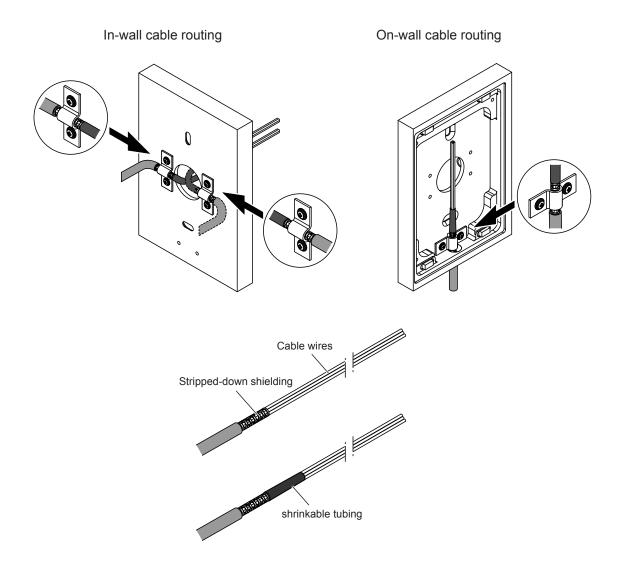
Fixing the exposed shielding of the CAN BUS cable(s) to the housing with the shielding clamp(s)
